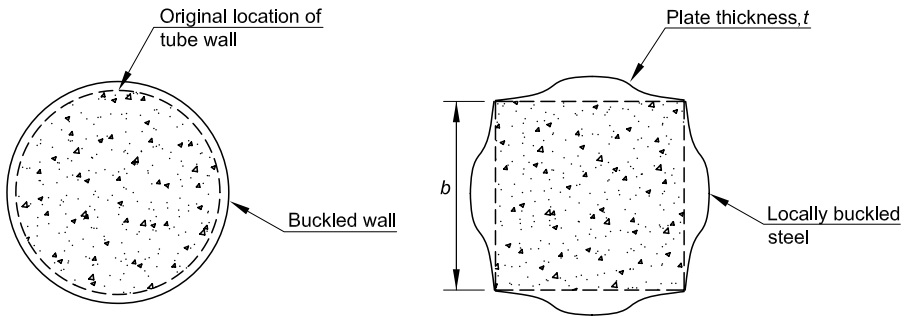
Change in cross-sectional buckling mode due to concrete infill.
